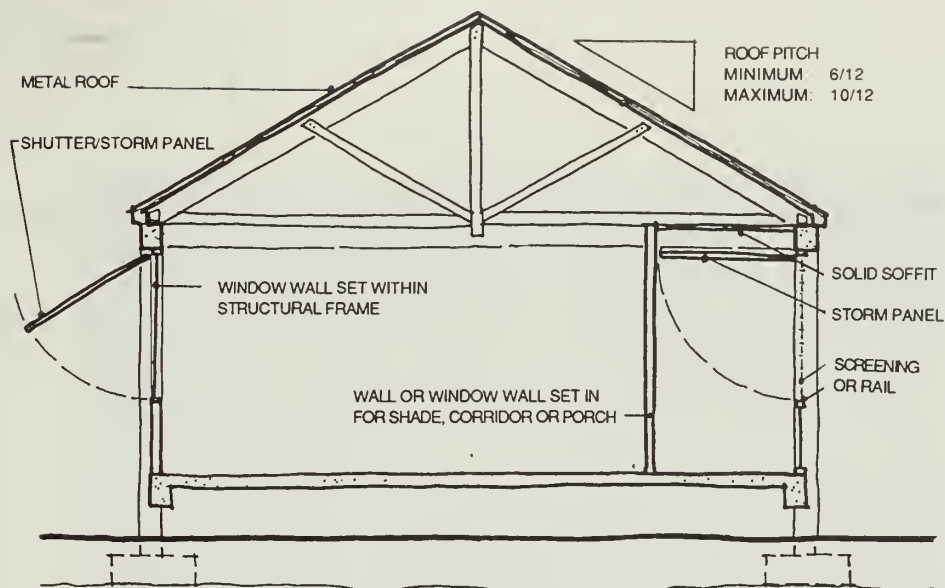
Cross-section showing potential material locations and pocketed storm panels.
